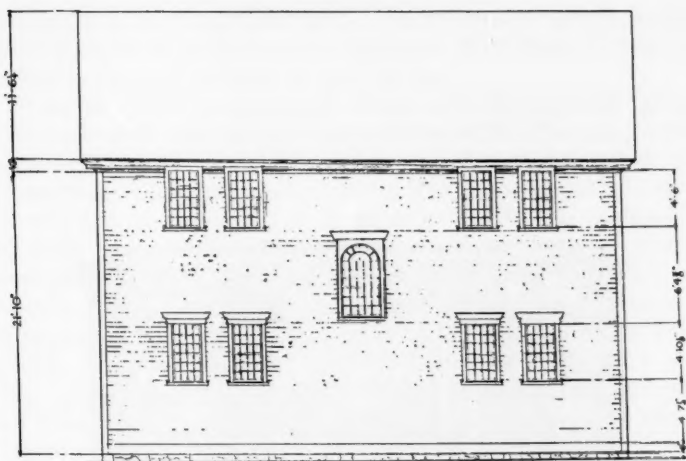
North elevation of Chestnut Hill meetinghouse, Millville, Massachusetts.
